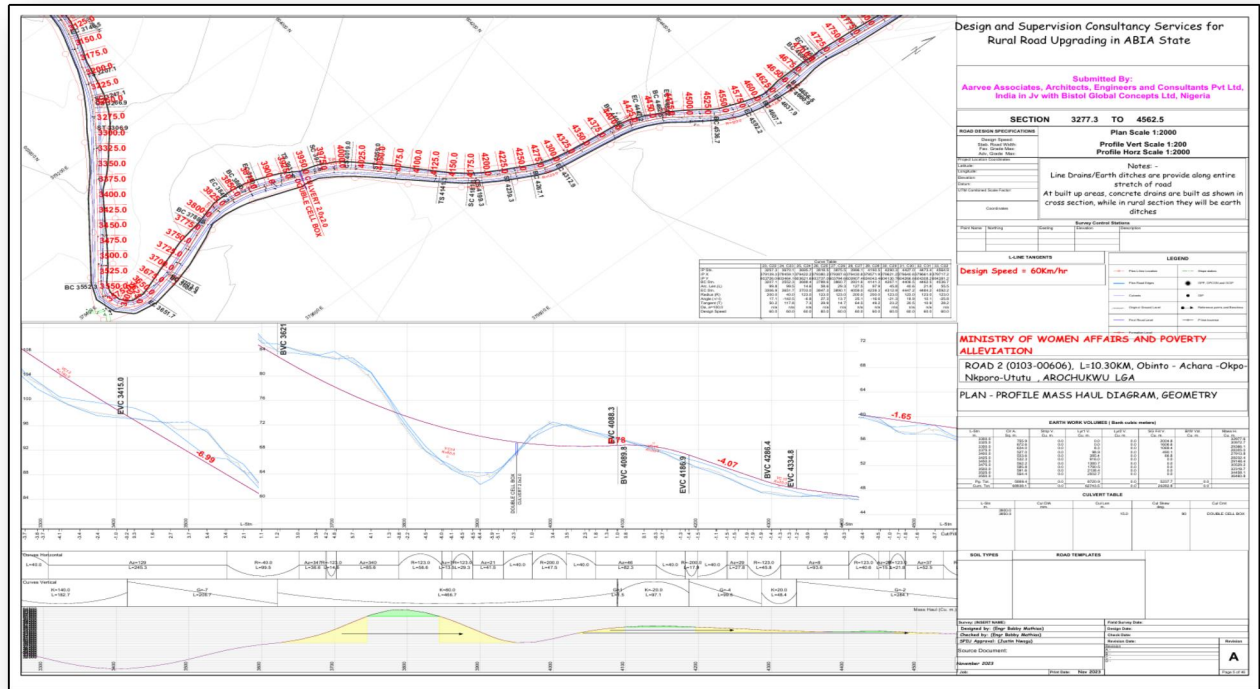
Upgrade Engineering Design B Plan - Profile Mass Haul Diagram, Geometry
